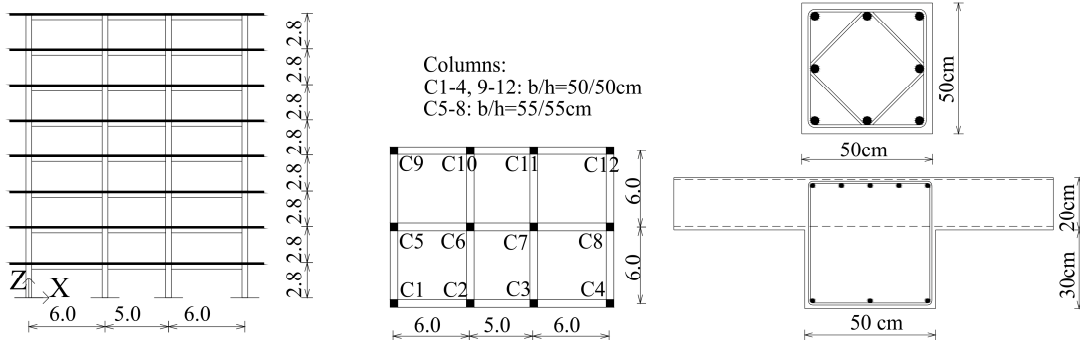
The elevation, plan view and reinforcement in typical columns and beams of 8-storey building
